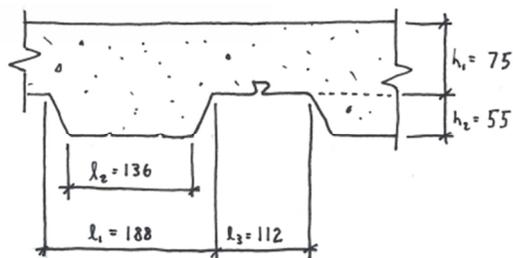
Profile of composite slab used in BRE Cardington Building
